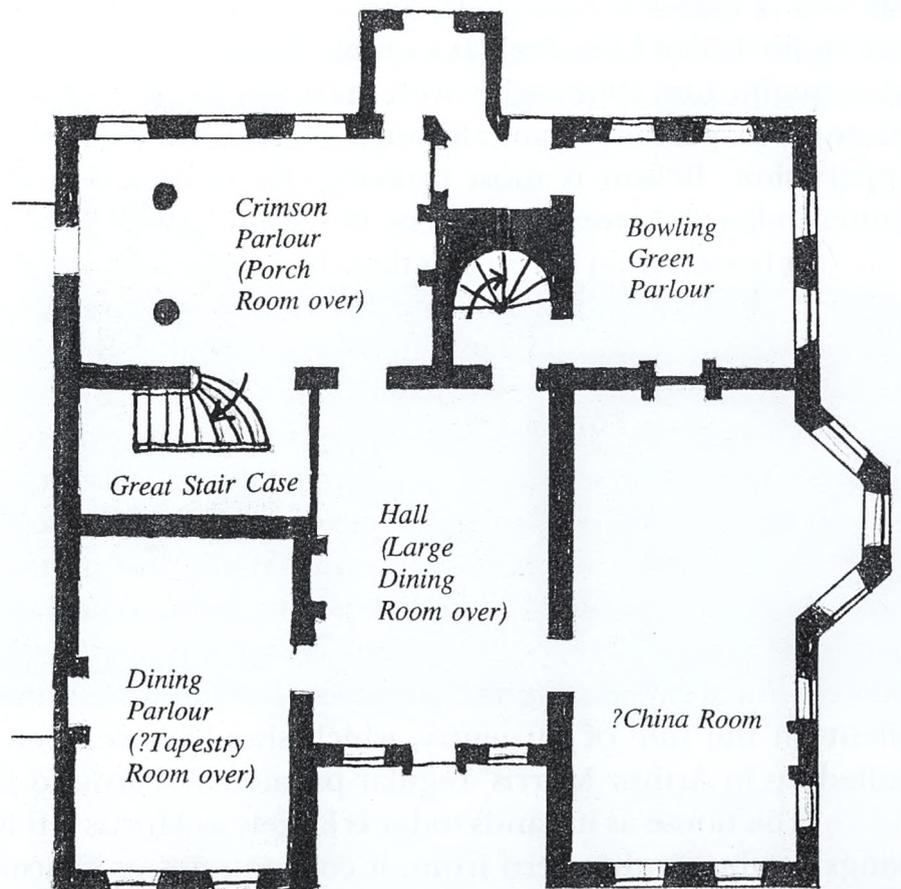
Ground Plan of Coombe Place today, indicating the rooms mentioned in Robert Stark's bill (appendix 2). Not to scale: adapted from ESRO SHR 2838,2839.
